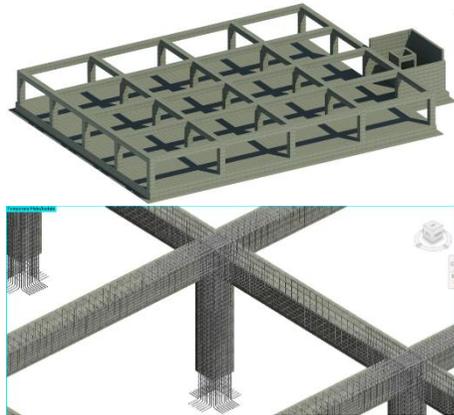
Reinforced Concrete Structural System and Column & Beam Reinforcement Modeling.
